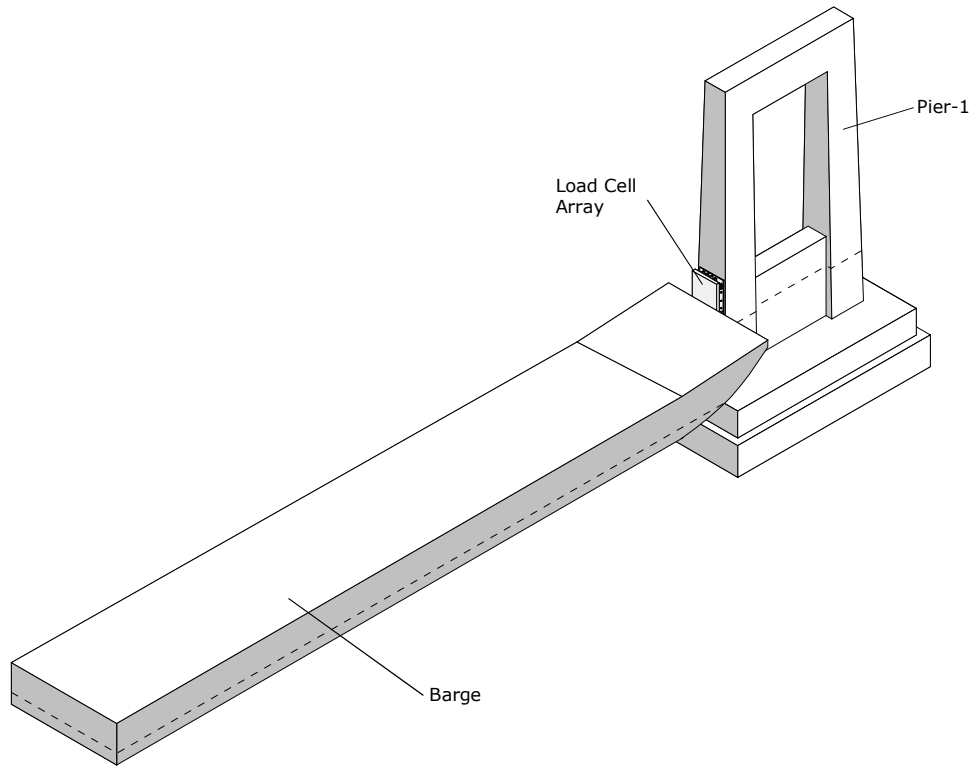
Pier-1, Barge and Load Cell Array for Pier-1
